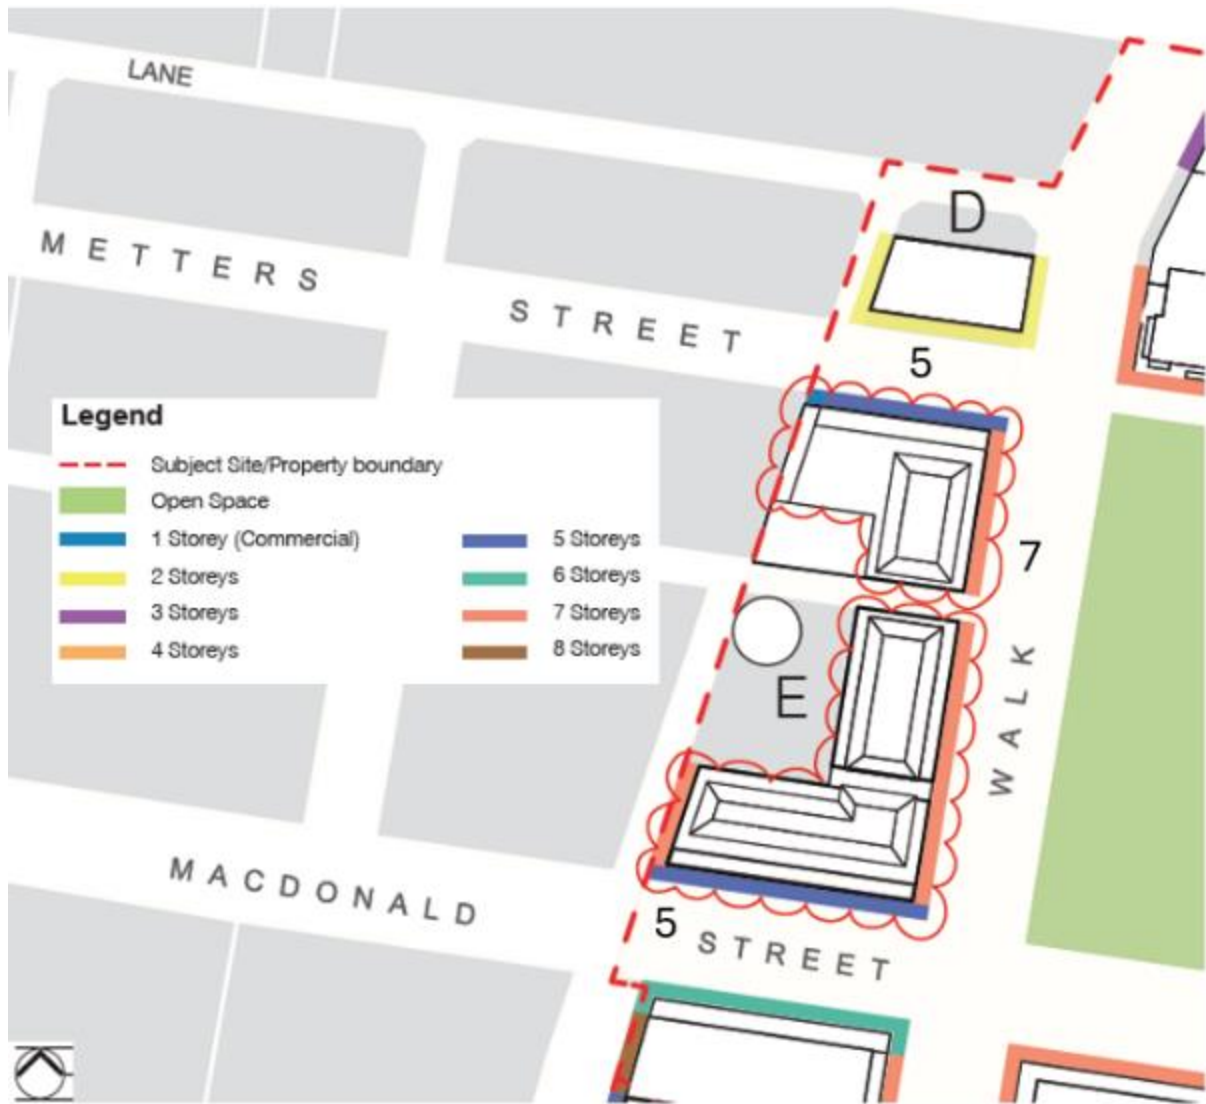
Proposed street wall heights for Block E - D/2015/966/G
